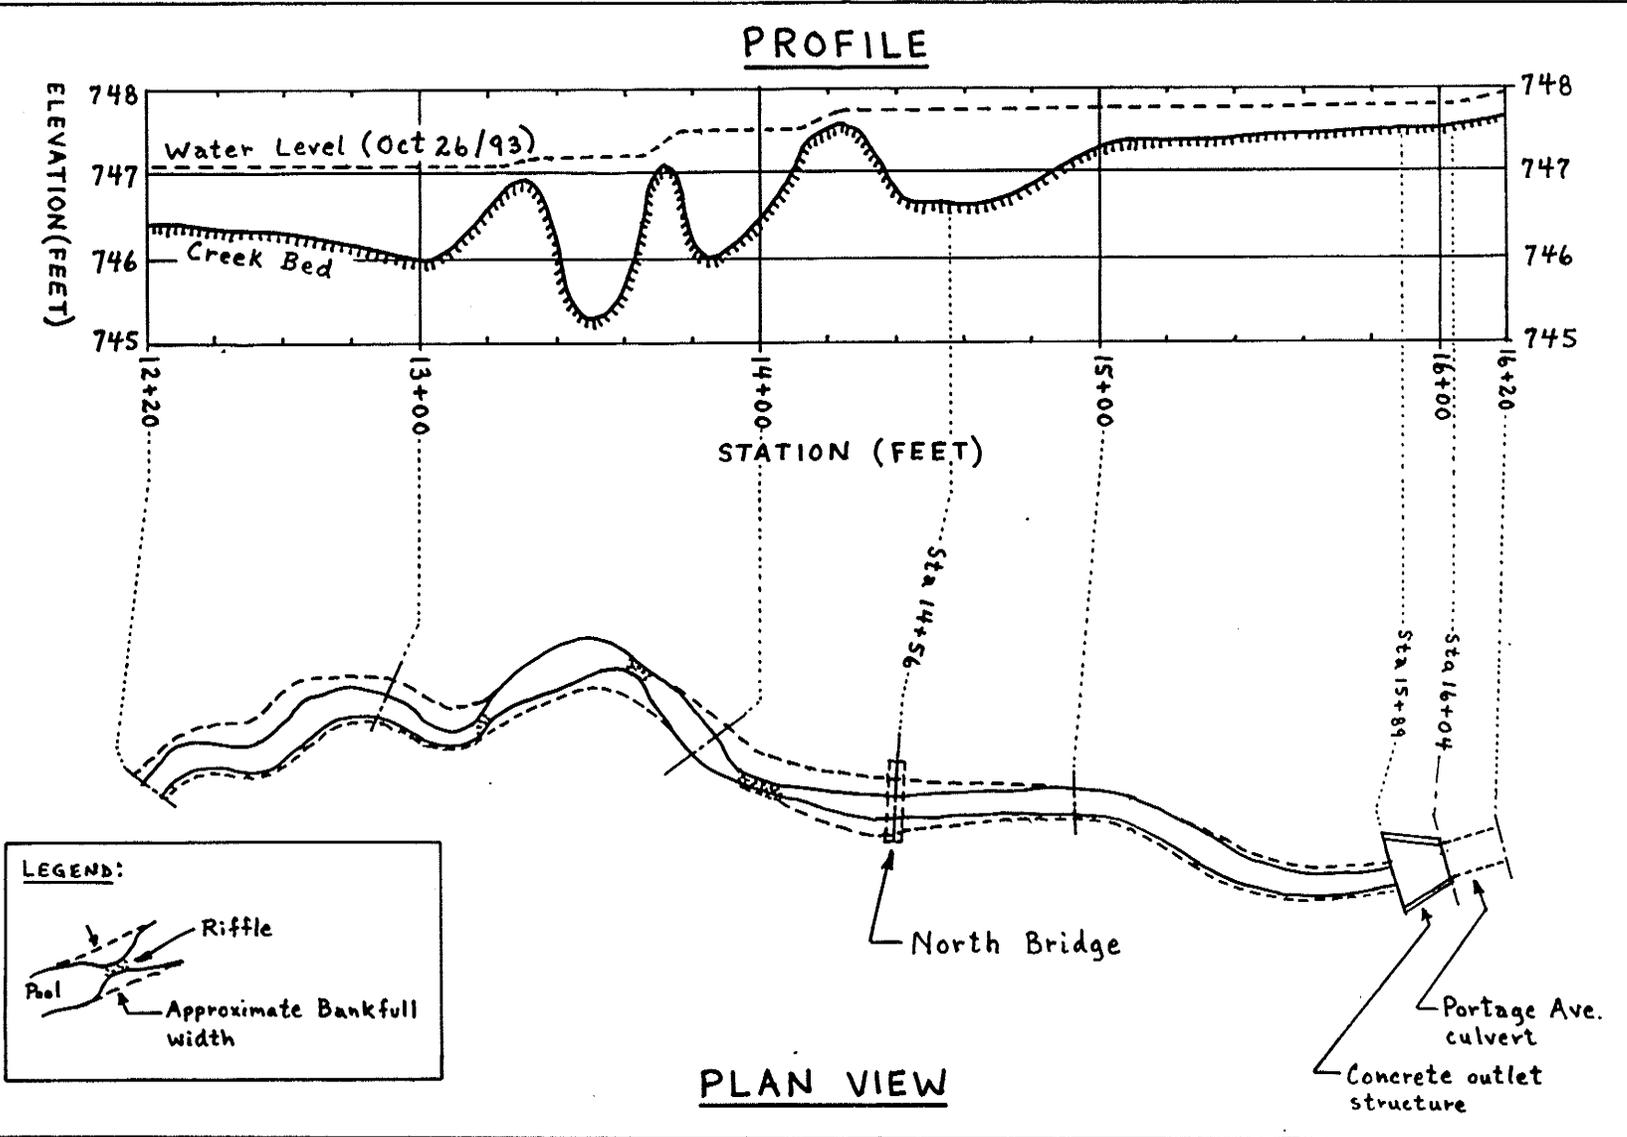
Detailed plan and profile views of the North Reach of Truro Creek in Bruce Park.
